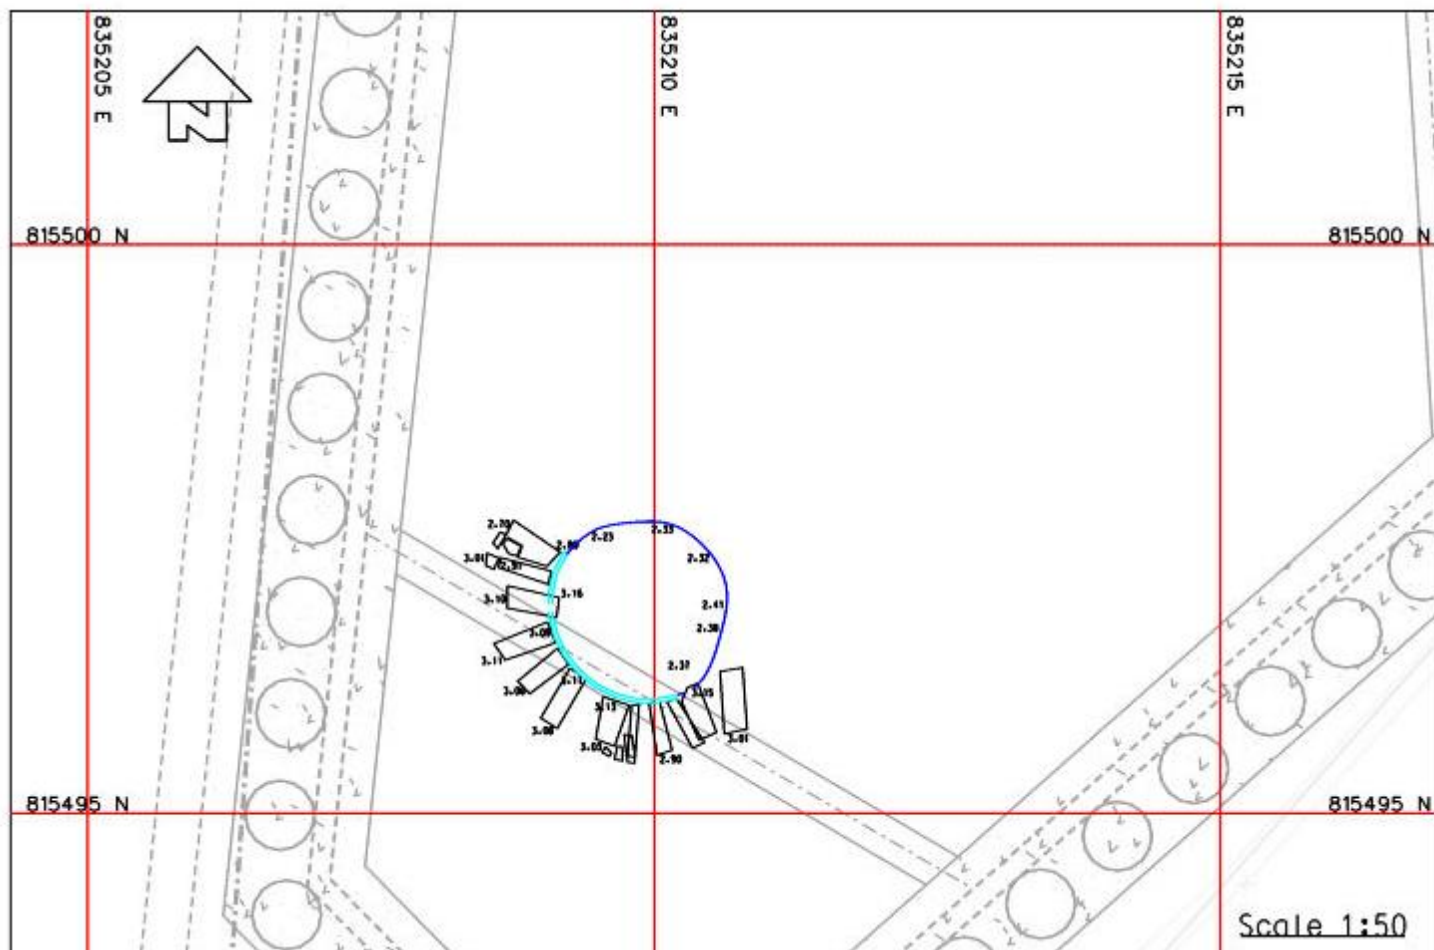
Drawing of top of well shaft (901-RISC-SUR-000675A) (drawing at 75%)
